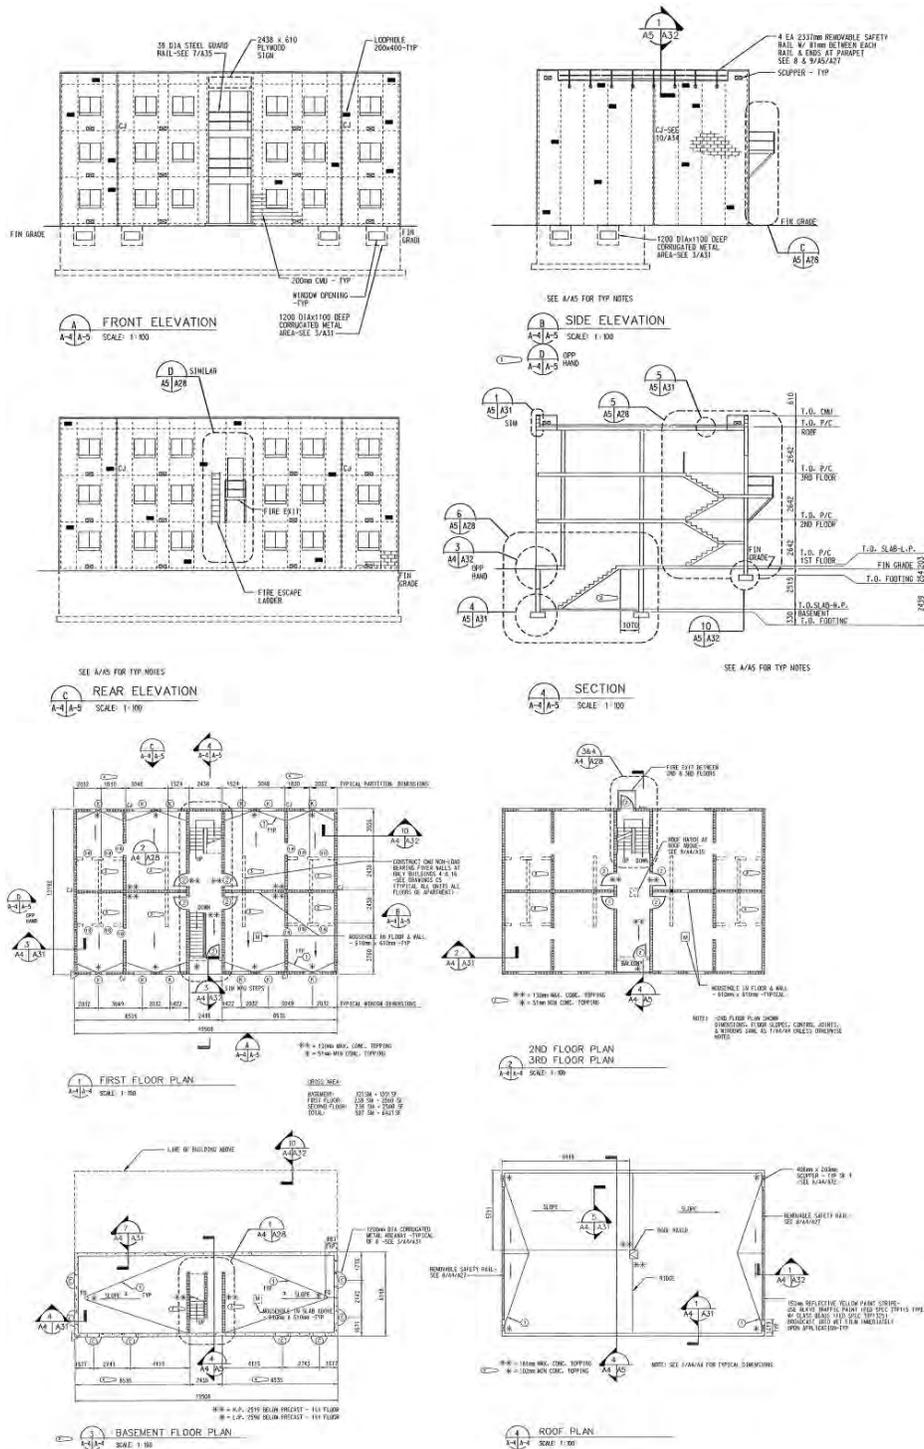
MOUT Apartment Building Elevations and Plans, Fort Bragg, NC, 2002 (standard drawing 179-97-01 A-4 sheet 56; military operations in urban terrain, MOUT training complex, apartment plans; 29 January 2002; standard drawing 179-97-01 A-5 sheet 57; military operations in urban terrain, MOUT training complex, apartment elevations; 29 January 2002).
